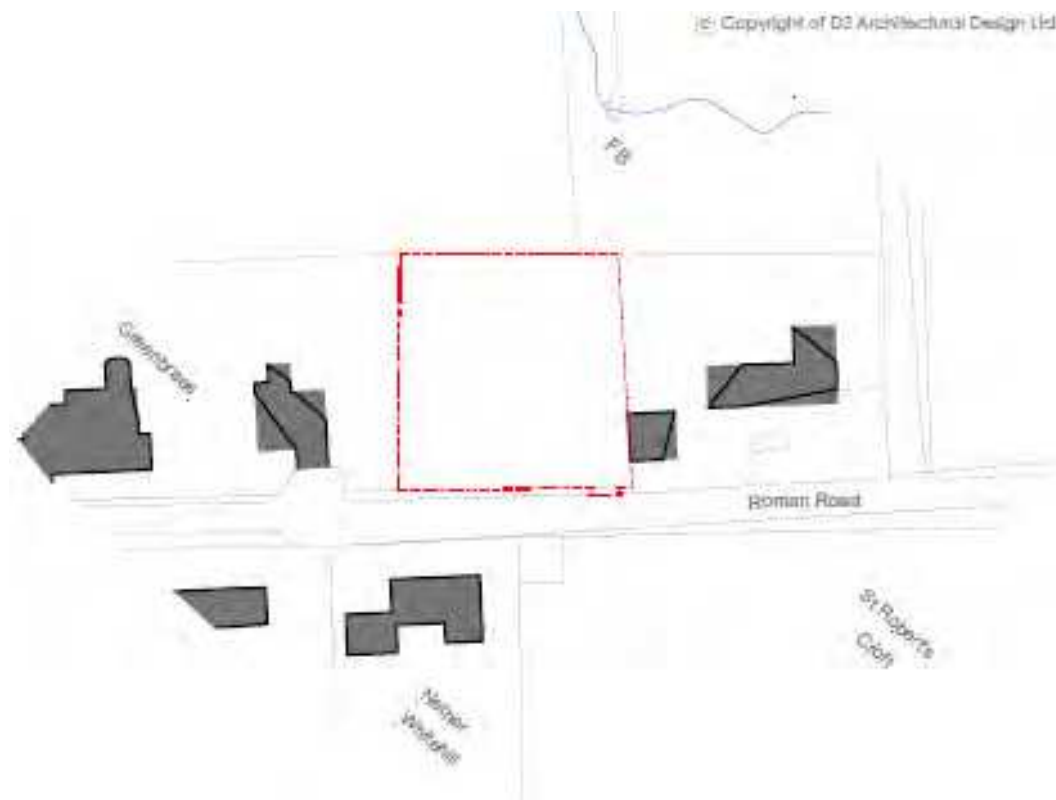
Extract from 23023-D01 Site Plan (Source: D2 Architectural Design).
